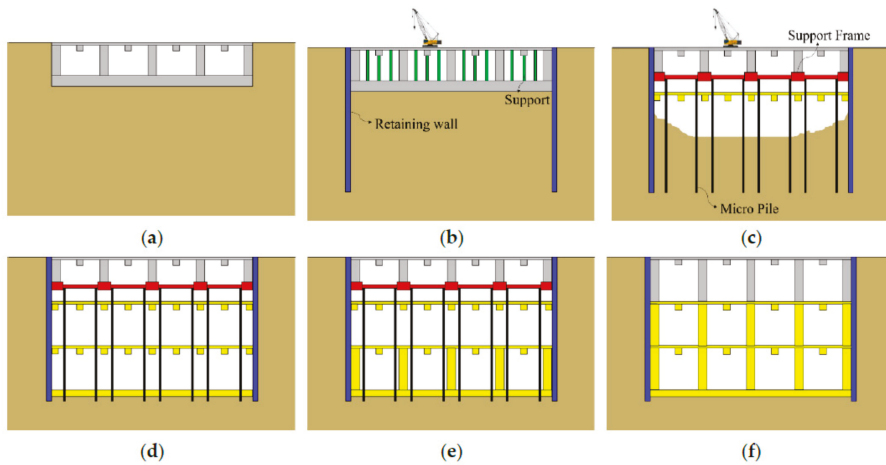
Vertical extension process for existing underground spaces using the top-down method with the MPD method (from a building with one basement floor to three basement floors). The process is listed as: (a) Existing underground structure; (b) Installation of temporary supports and retaining walls; (c) Installation of temporary piles and support frames and excavation (from B2 to B3); (d) Structural frame (beams and slabs) and foundation construction; (e) Installation of columns on floors (from B3 to B2); and (f) Decomposition of temporary piles and support frames.
